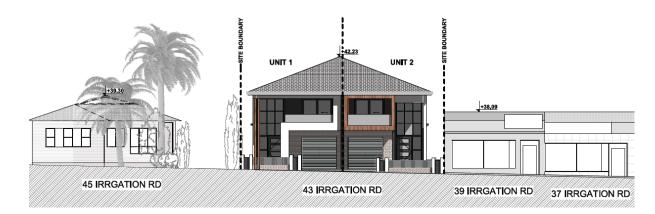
Streetscape Perspective from Irrigation Road, Looking North (Source: Dwell Designs, 2019)
